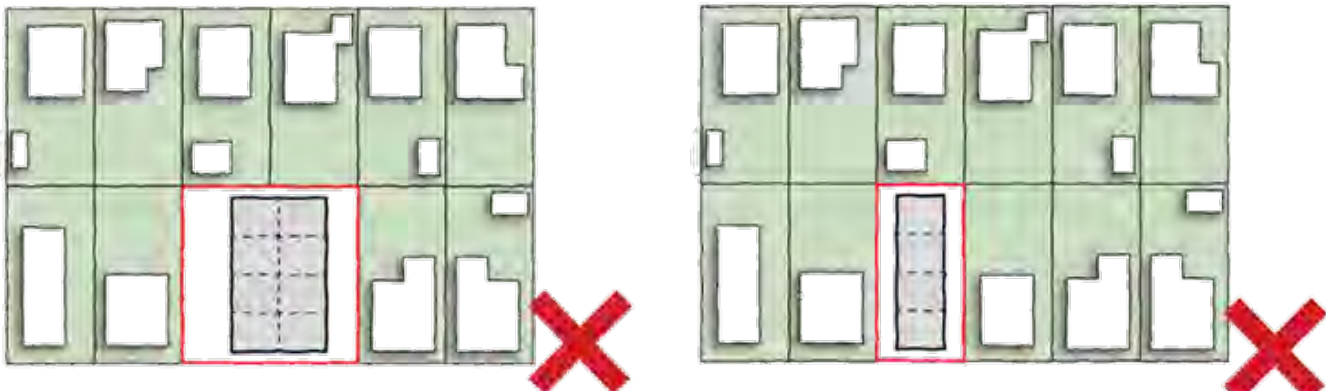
Respecting the existing pattern of development by breaking down larger buildings. Long rows of dwellings orientated toward the neighbours should be avoided where possible.
